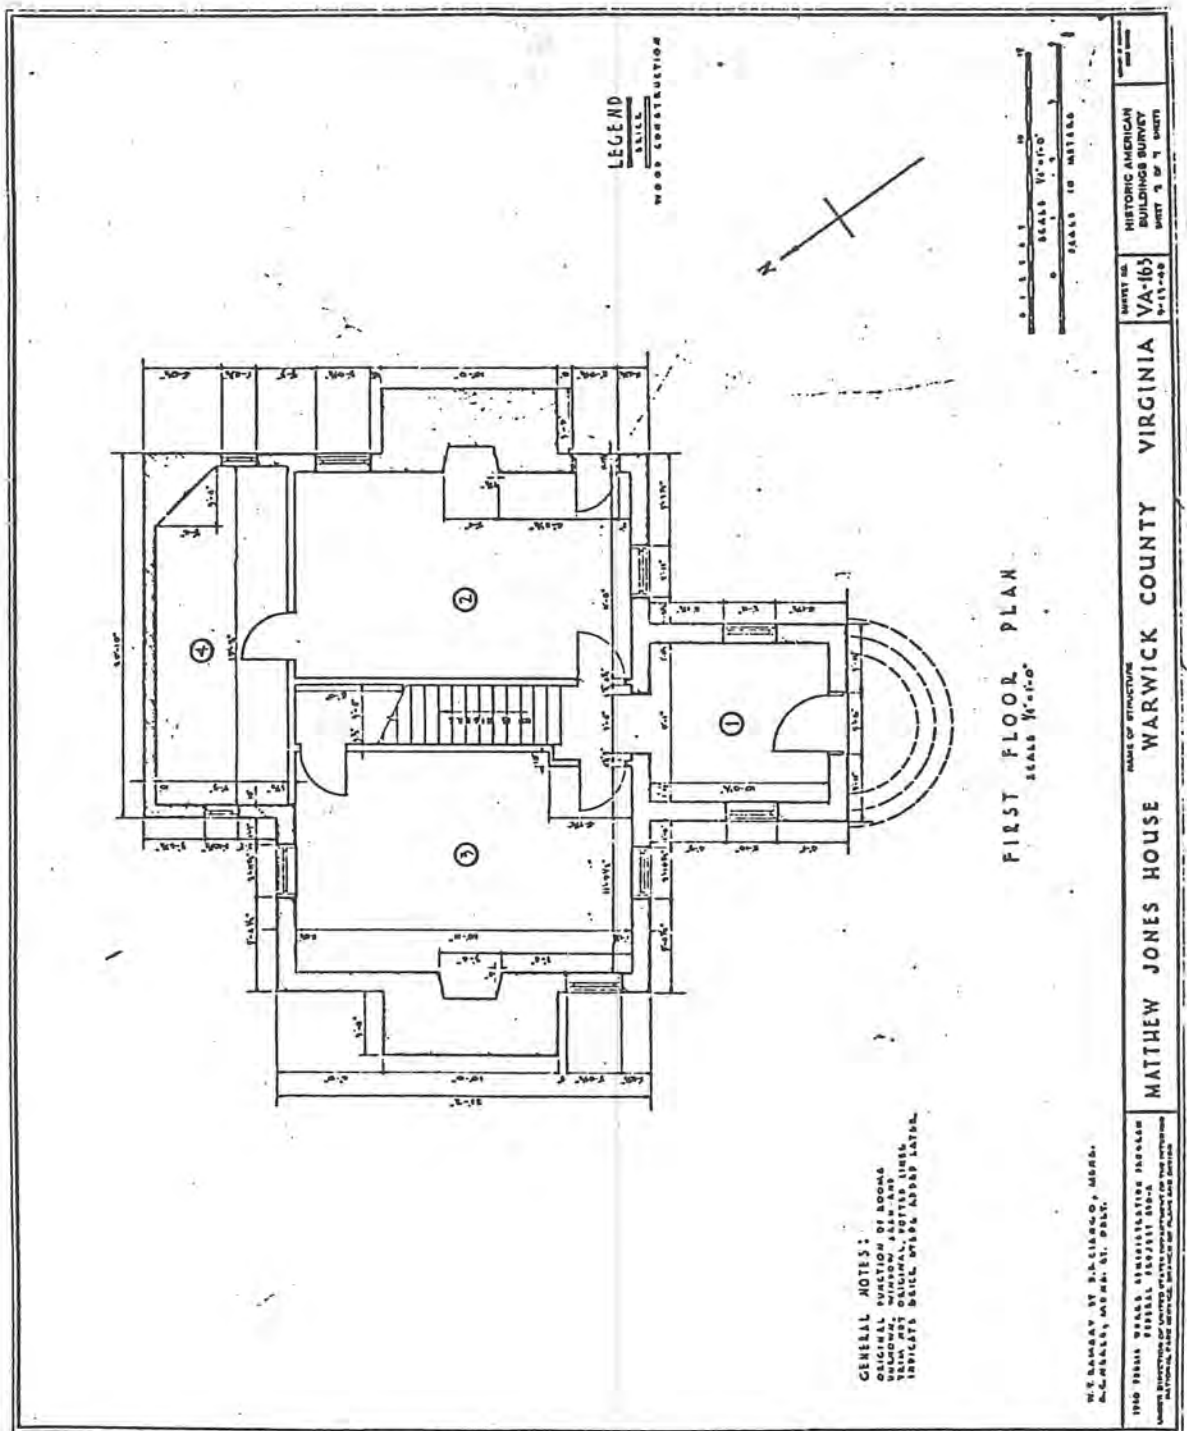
Matthew Jones House, HABS drawing (1940), first-floor plan.
